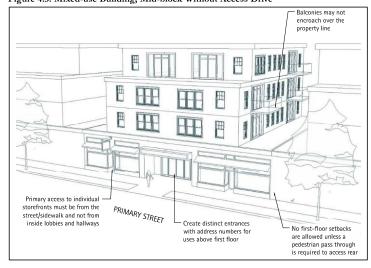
Mixed-use Building, Mid-block Without Access Drive
